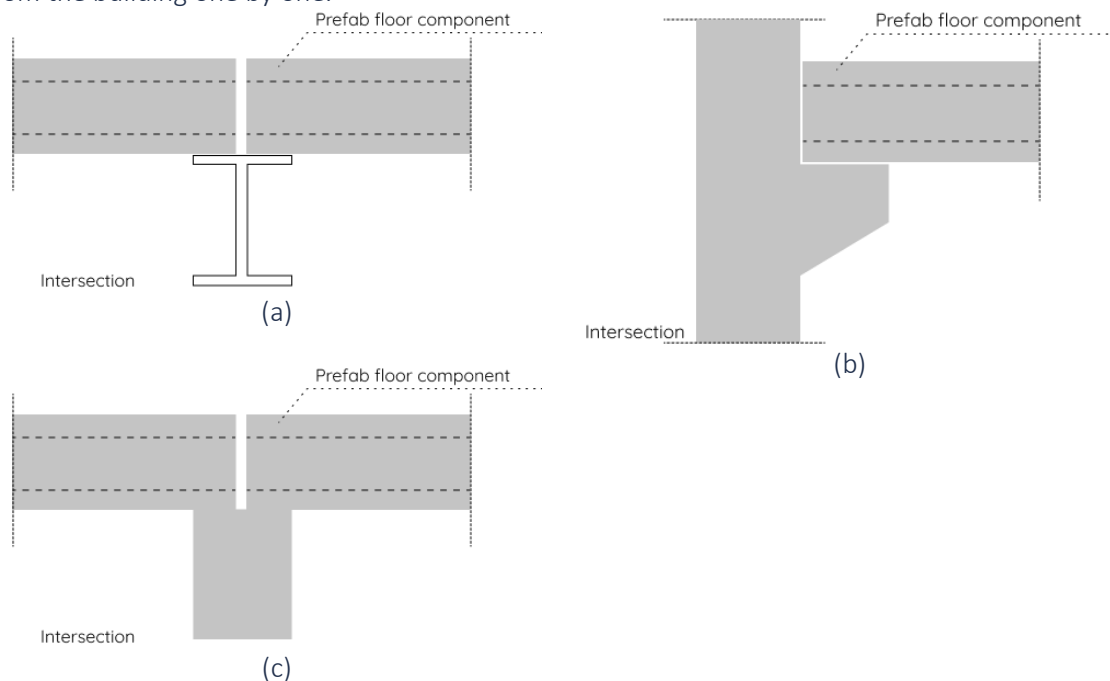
Examples of dry connection: A) steel beam welded – prefab floor connection B) prefab column + corbel – prefab floor. C) prefab column – beam.
